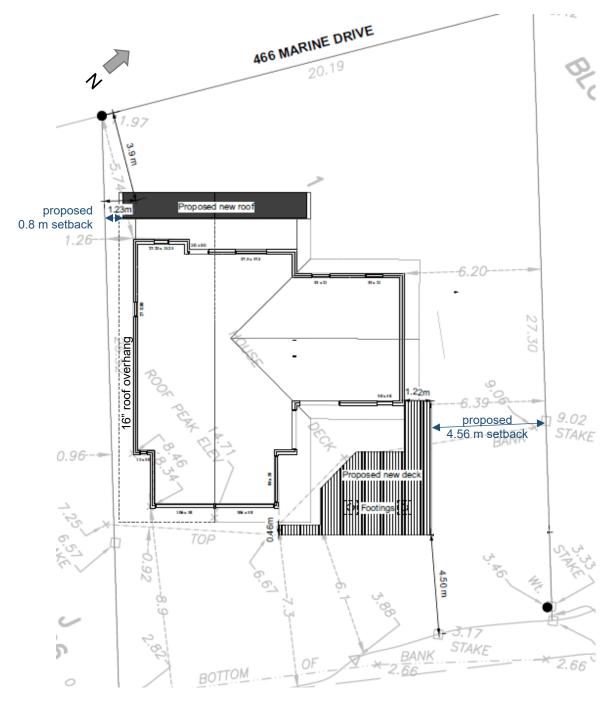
Site Plan showing location of proposed new deck and extension of existing roof over front porch.
